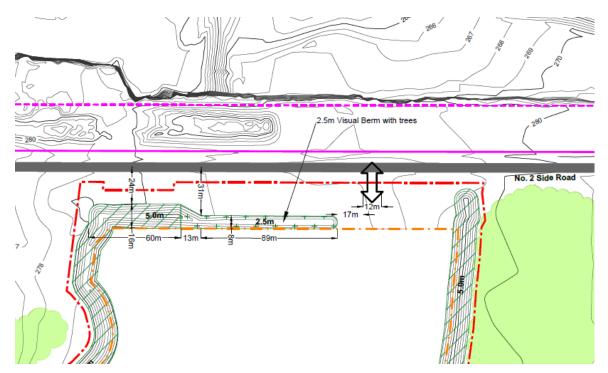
Location of proposed berms and crossing (MHBC)¹³.
